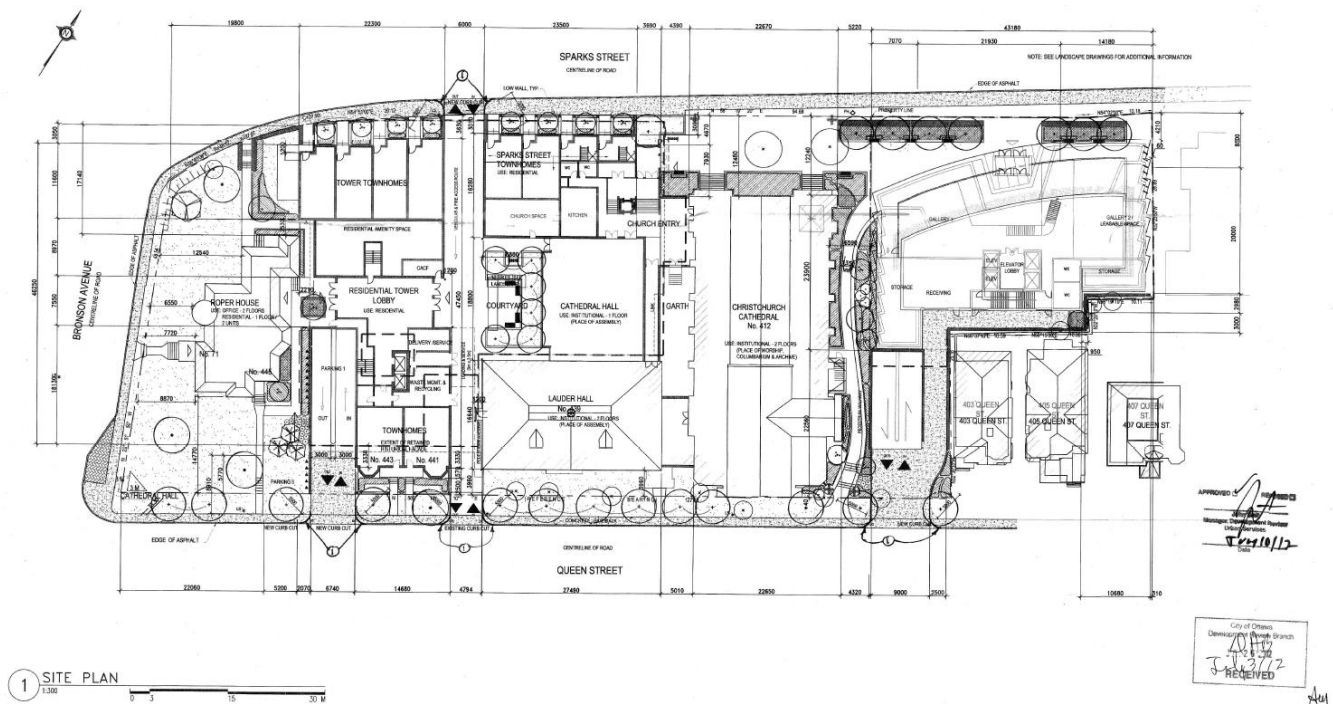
Originally Approved Site Plan (2012), HOK Architects Corporation
